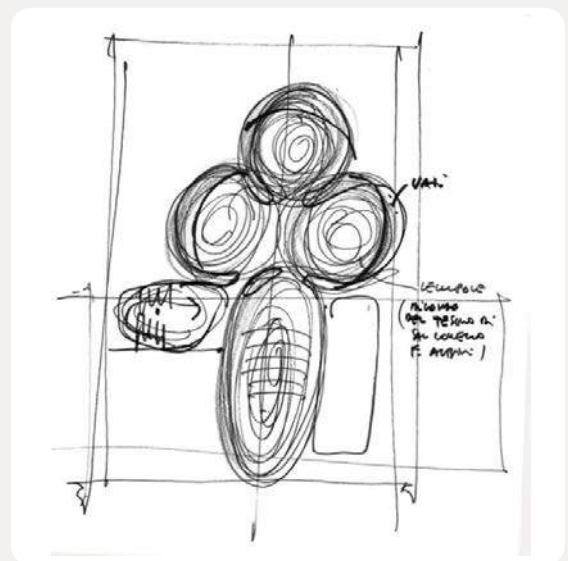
Underground floor sketch_©_MCA for Fondazione Luigi Rovati
